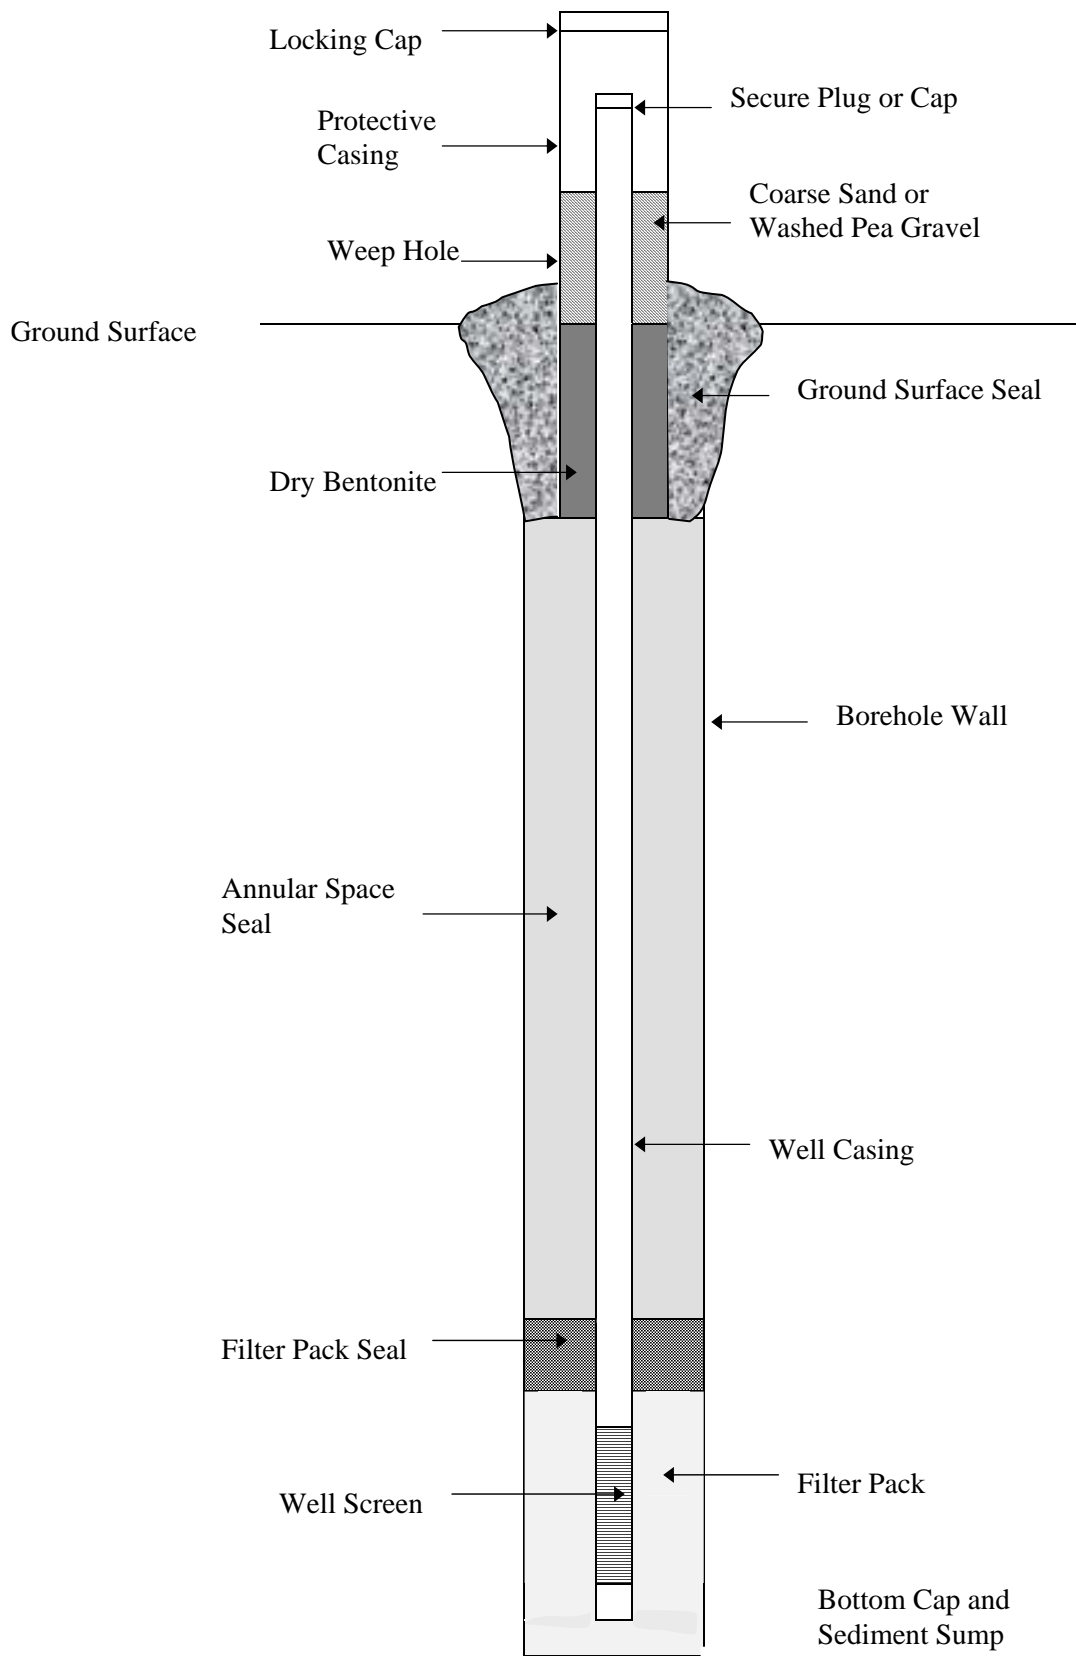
Drilled Monitoring Well in Overburden with Protective Casing (not to scale)
